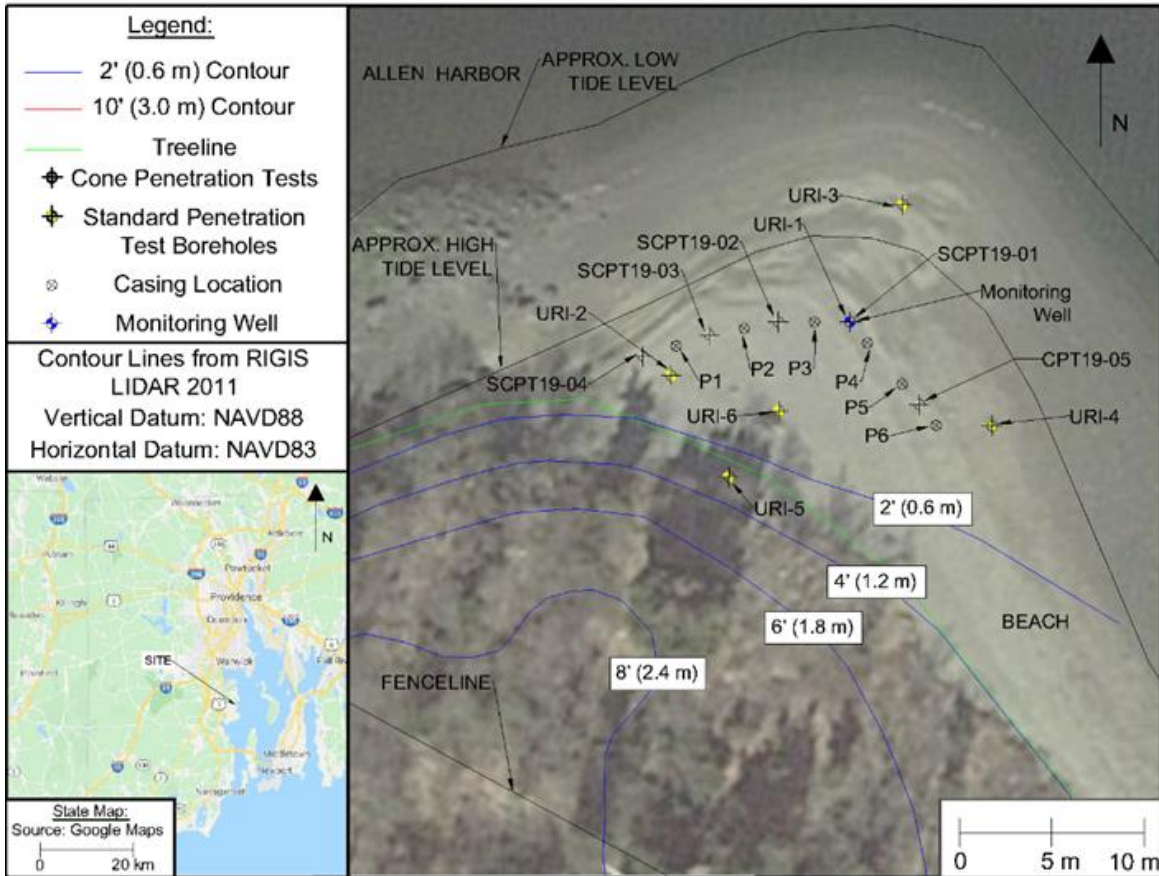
Site plan of geotechnical investigations and pile testing at the URI test site
